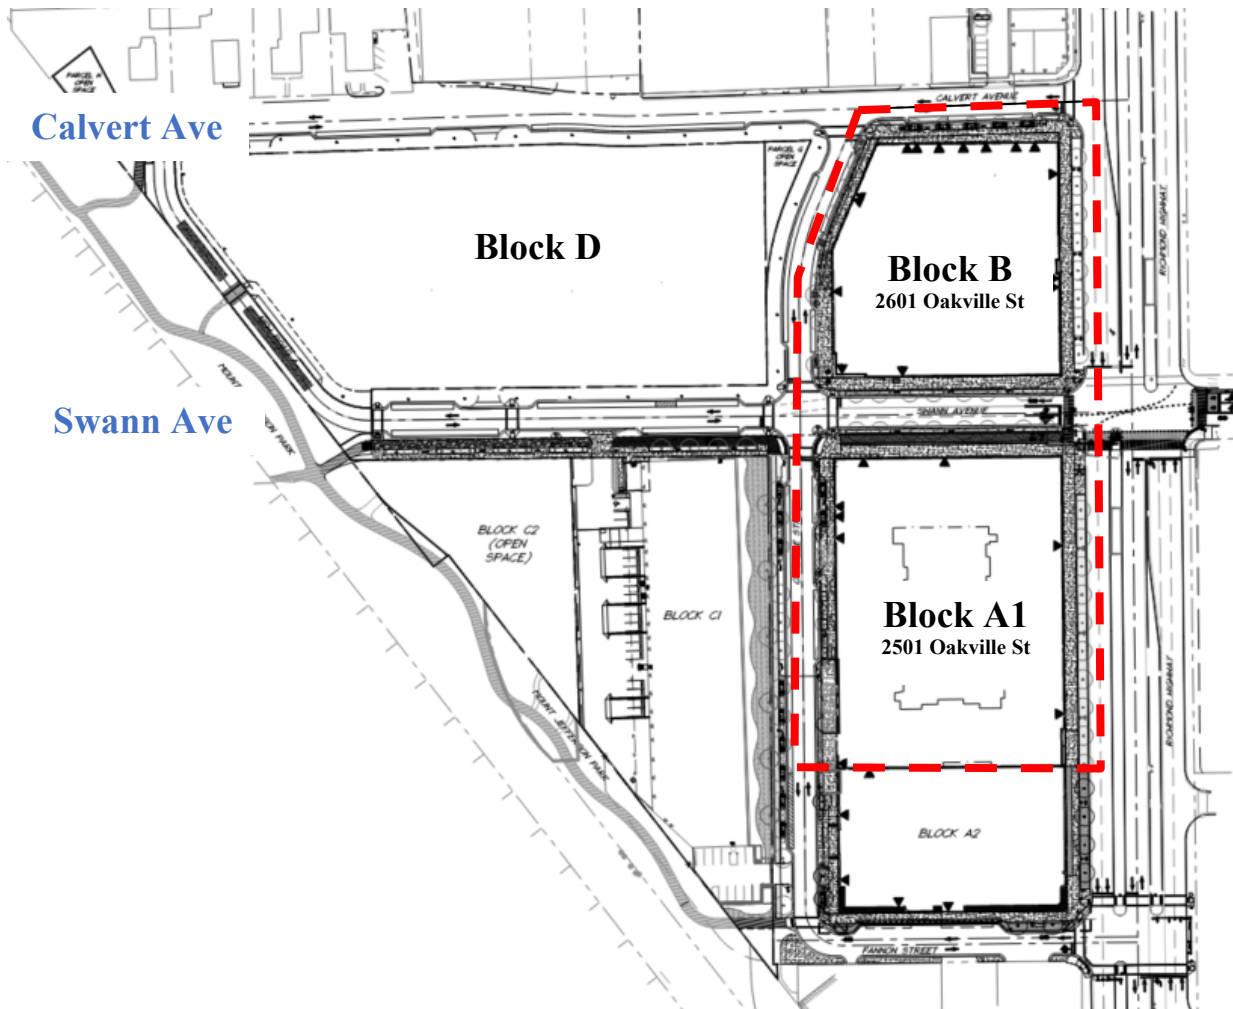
Oakville Triangle neighborhood with area subject to coordinated sign plan, Block B and Block A1, outlined in red.
